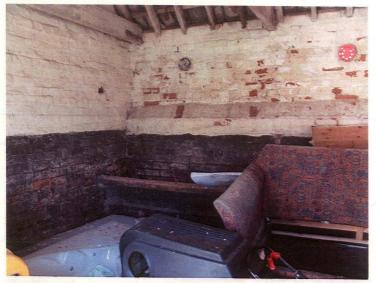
NW-SE Range, manger and chamfered wall, looking north
